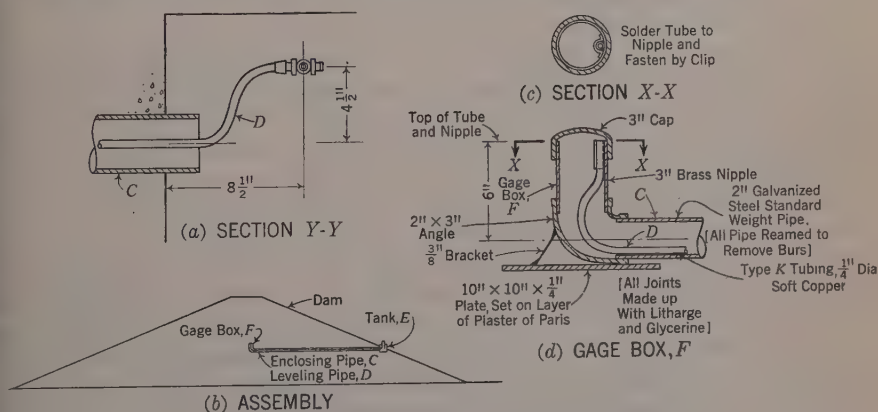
DETAILS OF TYPE C SETTLEMENT GAGE
